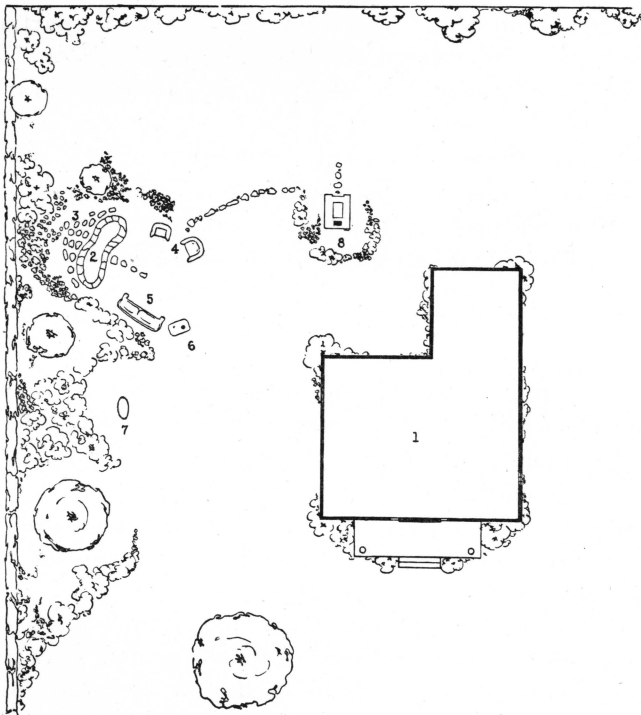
A plan for an outdoor living room: 1 dwelling, 2 lily pool, 3 rock garden, 4 chair, 5 seat, 6 table, 7 bird bath, 8 oven.
